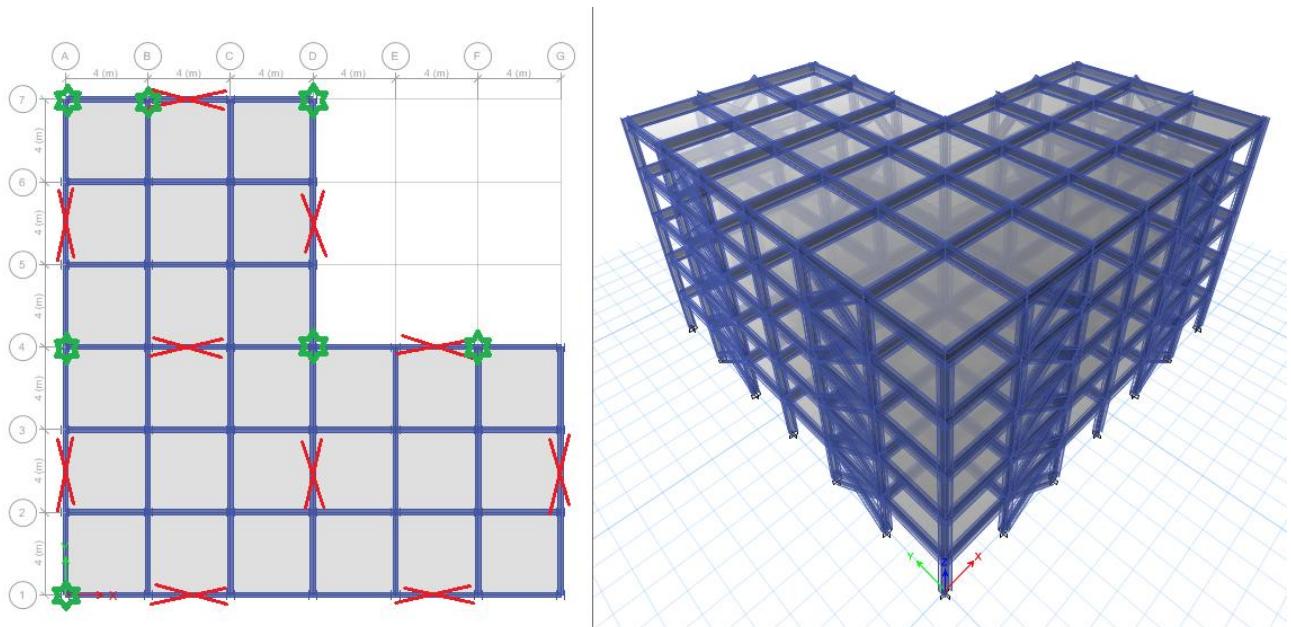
Arrangement of bracing system in irregular 5-storey building
